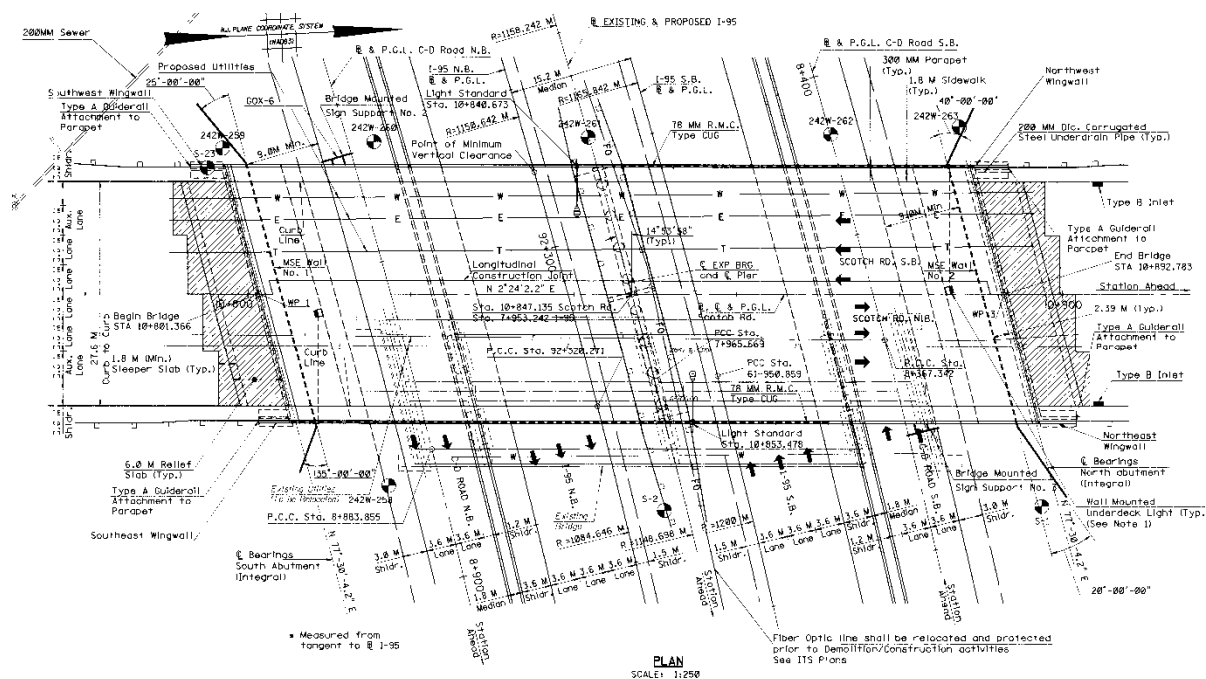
Scotch Road Bridge – Plan (Courtesy of NJDOT)
